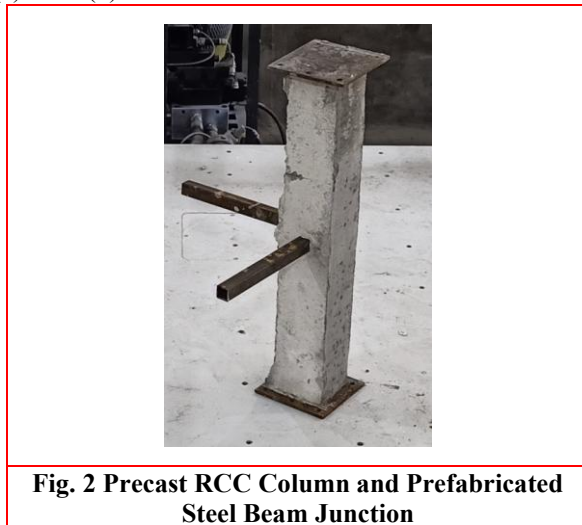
Precast RCC Column and Prefabricated Steel Beam Junction
